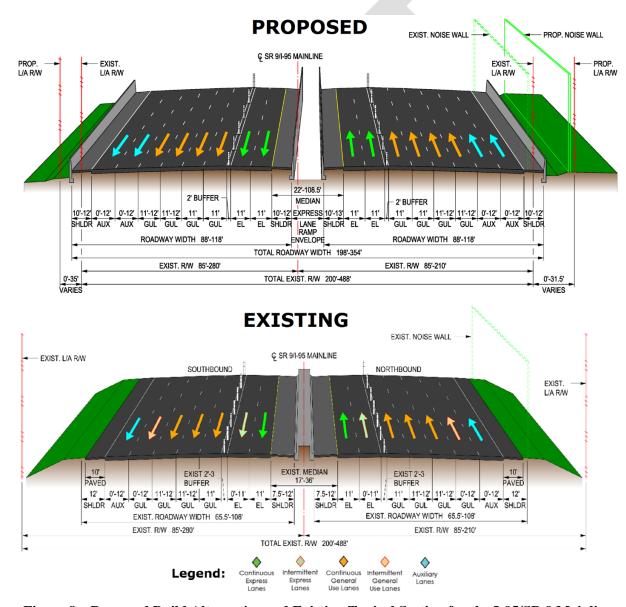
Proposed Build Alternative and Existing Typical Section for the I-95/SR 9 Mainline
